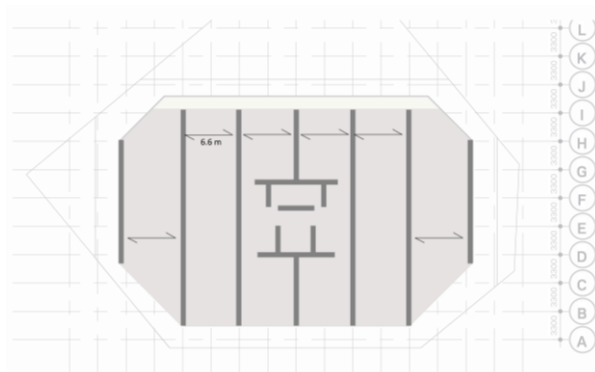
Floorplan concrete design variant. Adapted from personal communication R. Crielaard, September 9, 2021.
